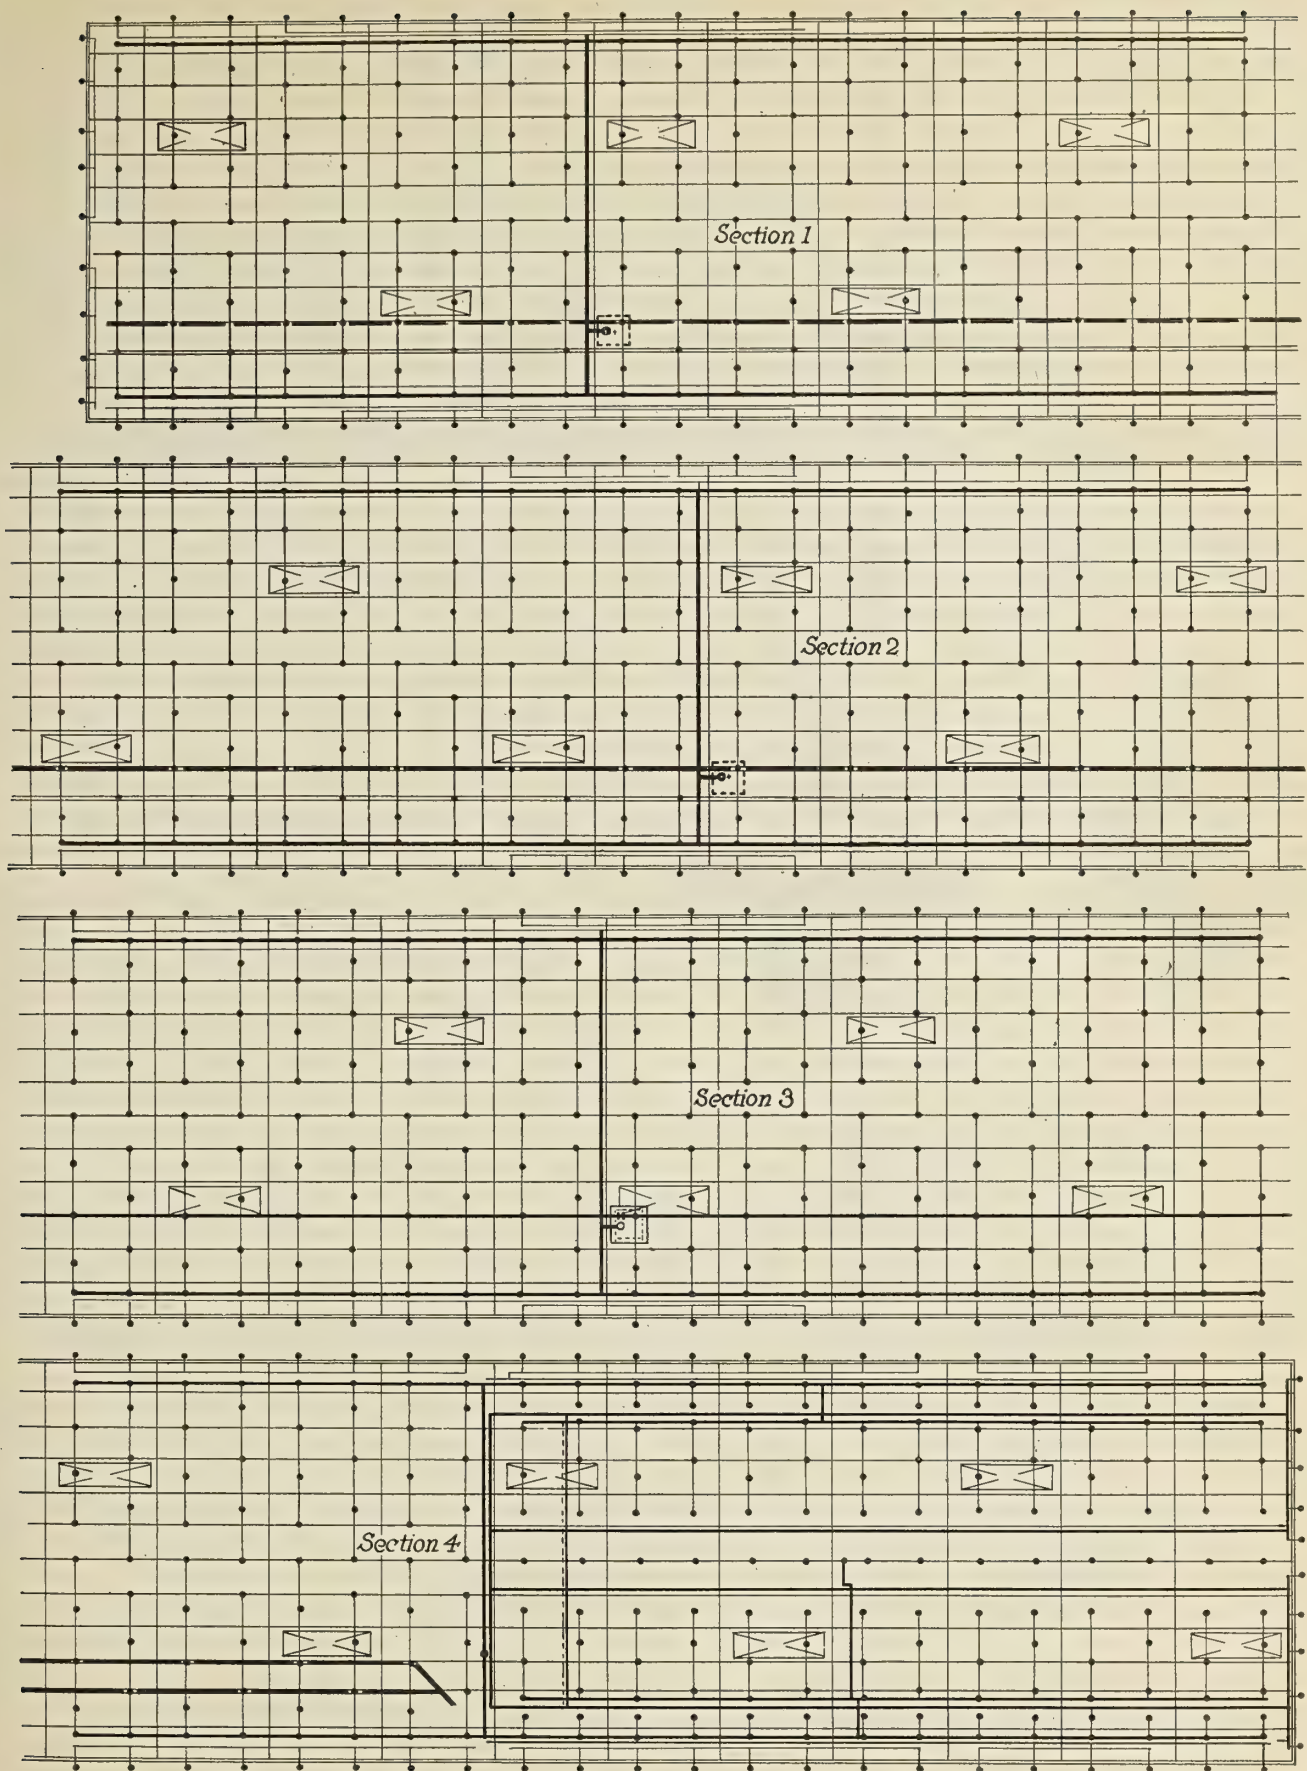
The Layout of Sprinkler System in Typical Pier Property. Note the Provisions for Sprinkler Protection against Exposure Fires and for Curtain Boards to Cut Up Ceiling Areas and Allow Heat to Bank at the Sprinkler Heads
